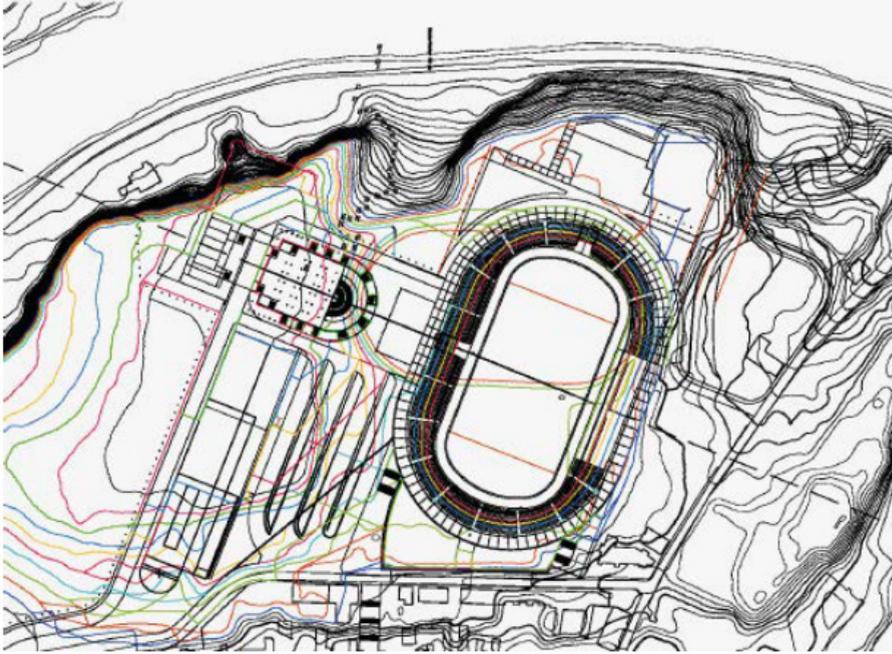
The Site plan according to original drawing with elevation map, 2008
